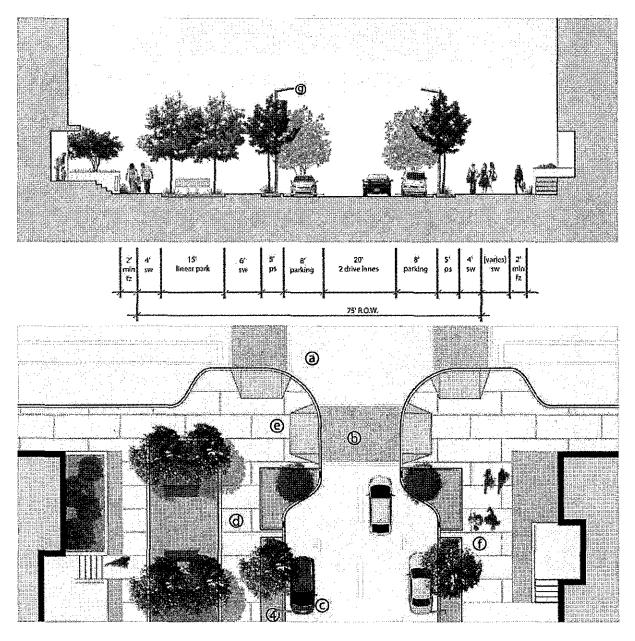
EXHIBIT ___F (Page 6 of 8) <u>Streetscape Standards</u>
